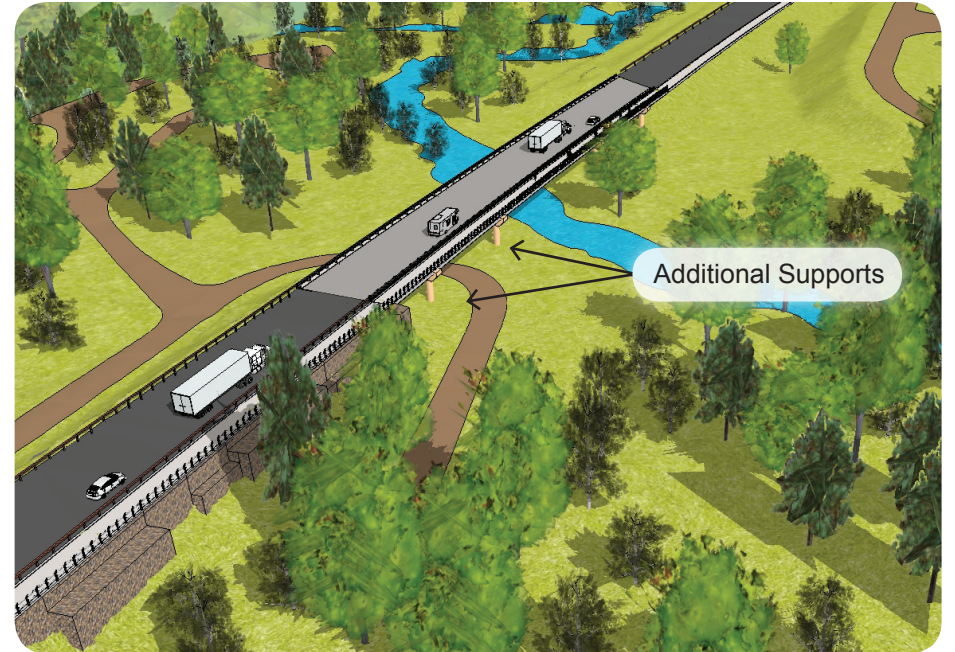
Bird's-eye view of the pedestrian retrofit along the retaining wall and Jocko Bridge superstructure.
